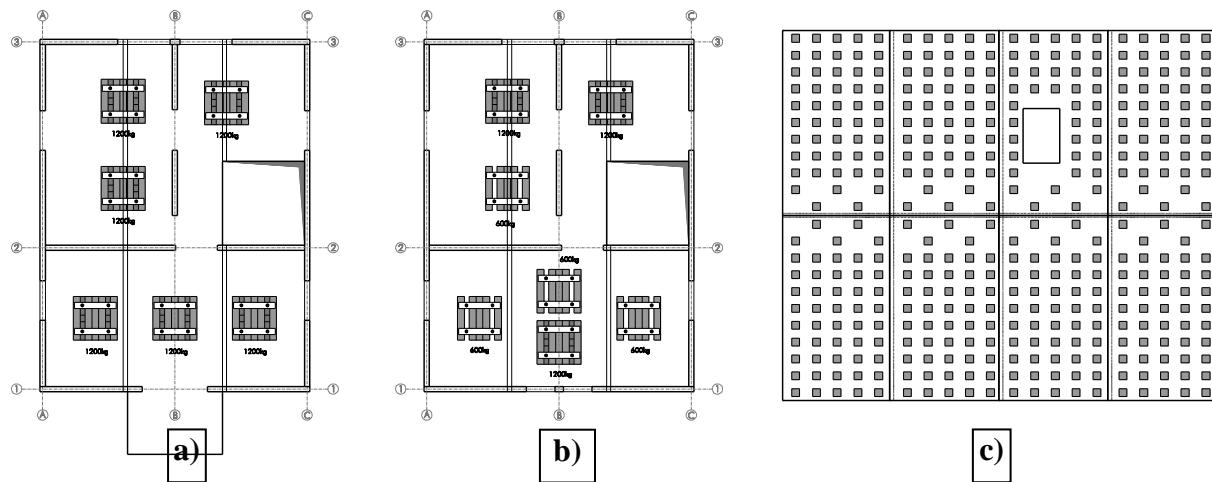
Arrangement of the additional loads: a) second floor; b) third floor; c) roof
